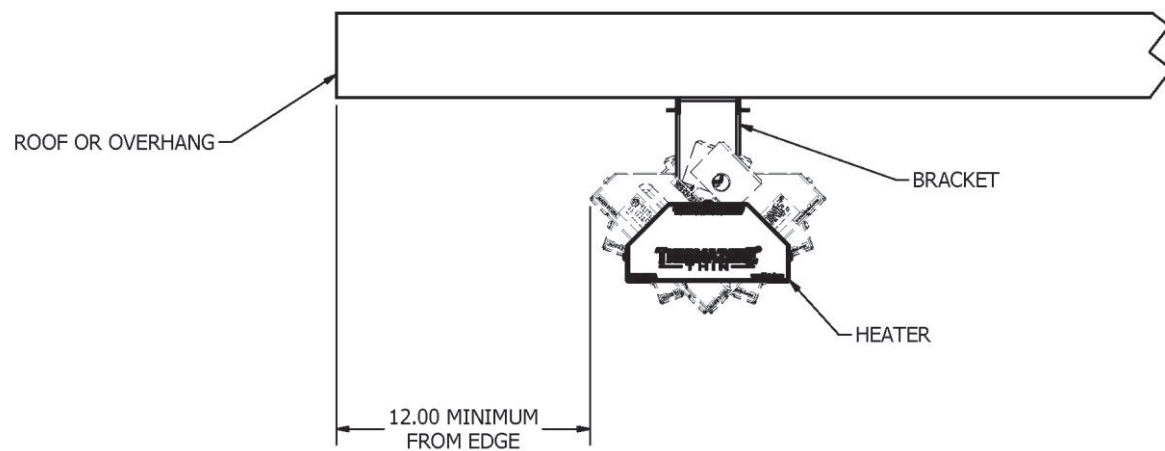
PROTECTED AREA CEILING MOUNTING
